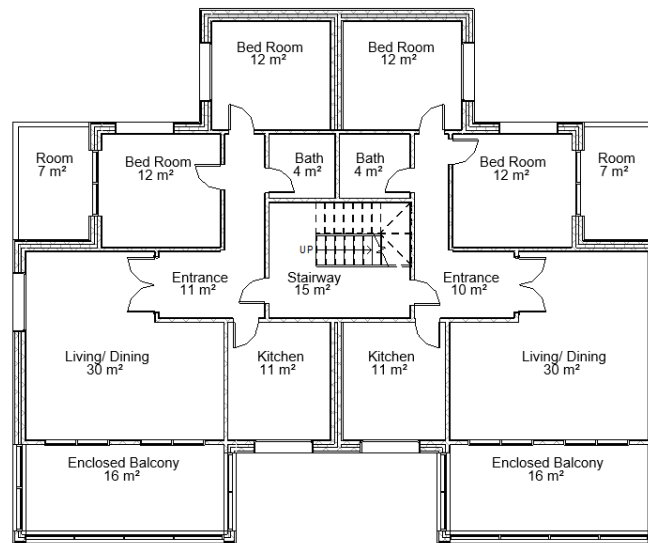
Plan used for second simulation having glazed balconies overlooking the west orientation, Source: Author
